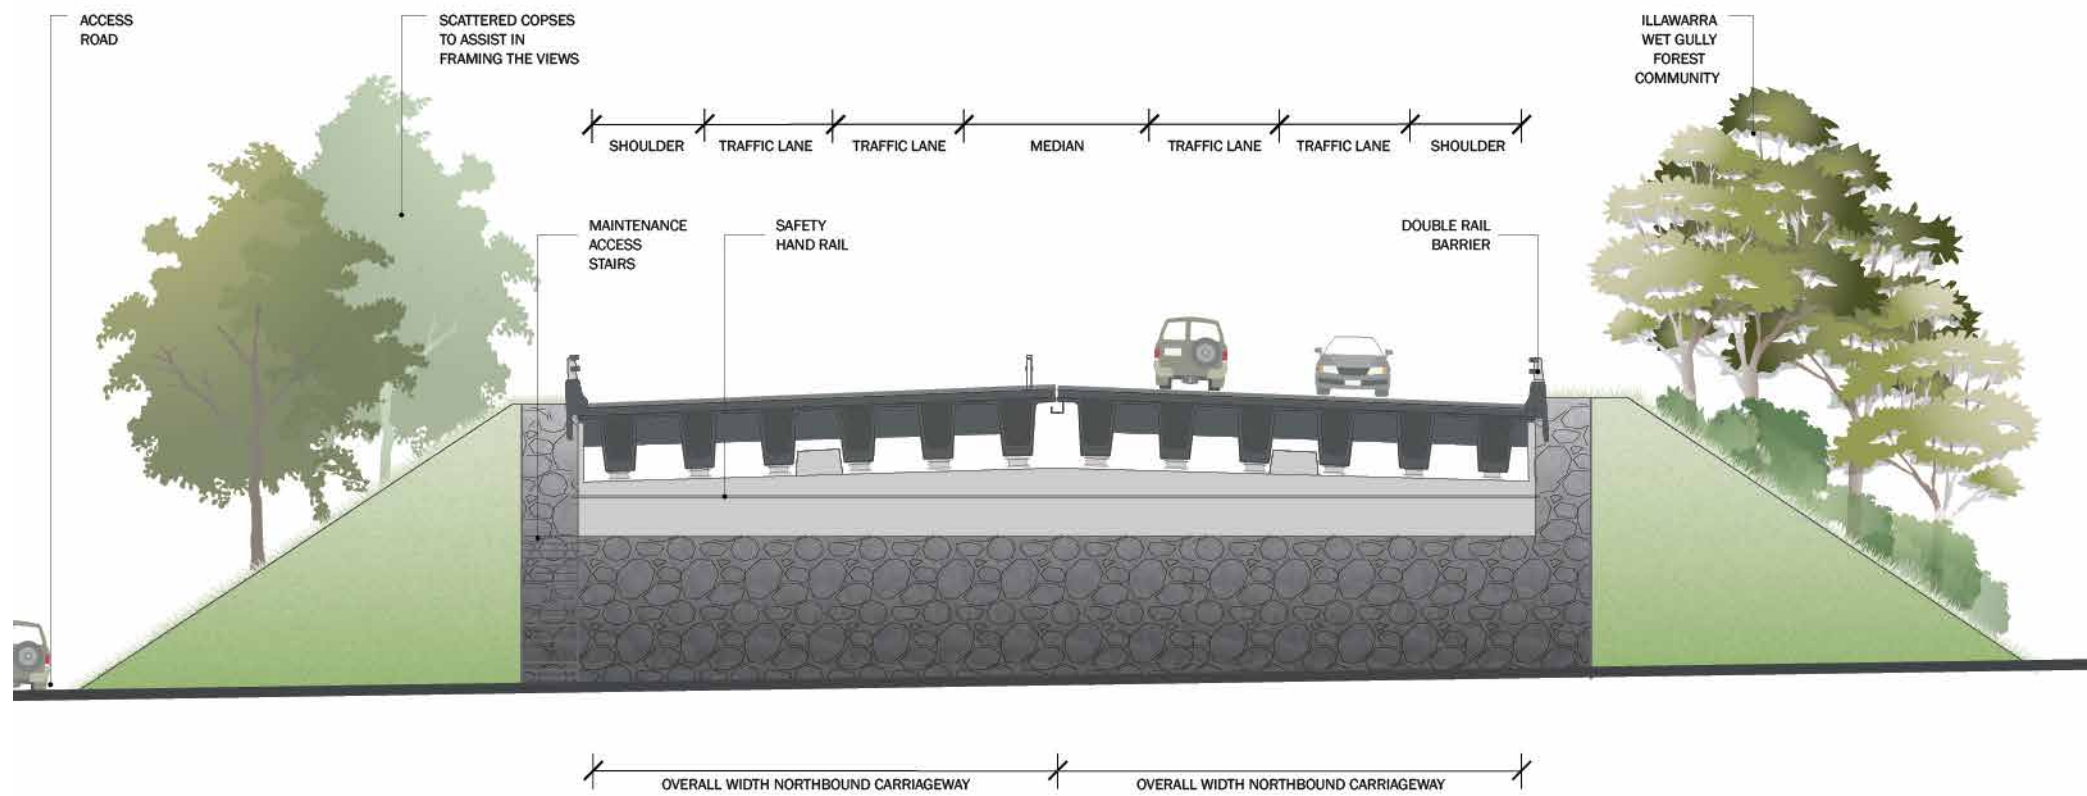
Section – Bridge SB05: Austral Park Road Underpass
